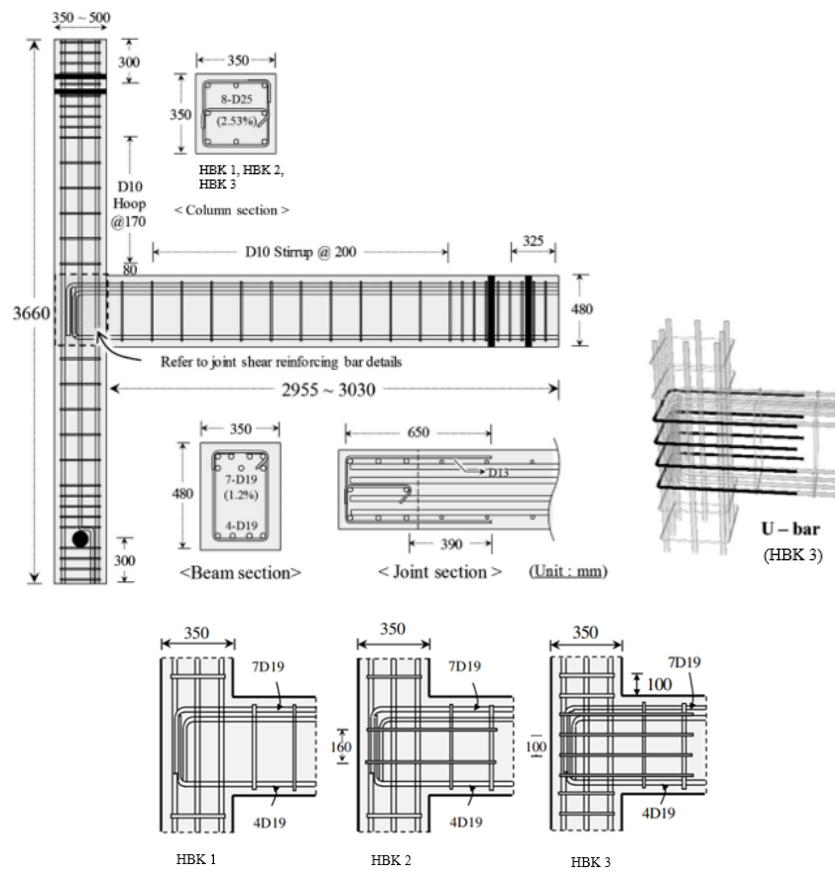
Dimensions and reinforcement details of exterior connection specimens.
